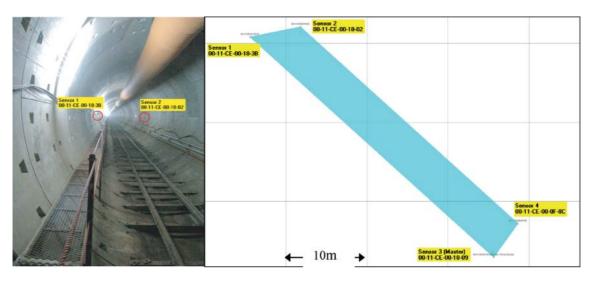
Four UWB-AoA sensors installed in a 5 m by 30 m section of the tunnel.
